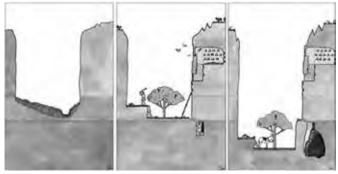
Sketch of construction of a drainage tunnel for land reclamation (drawing R. Bixio).
